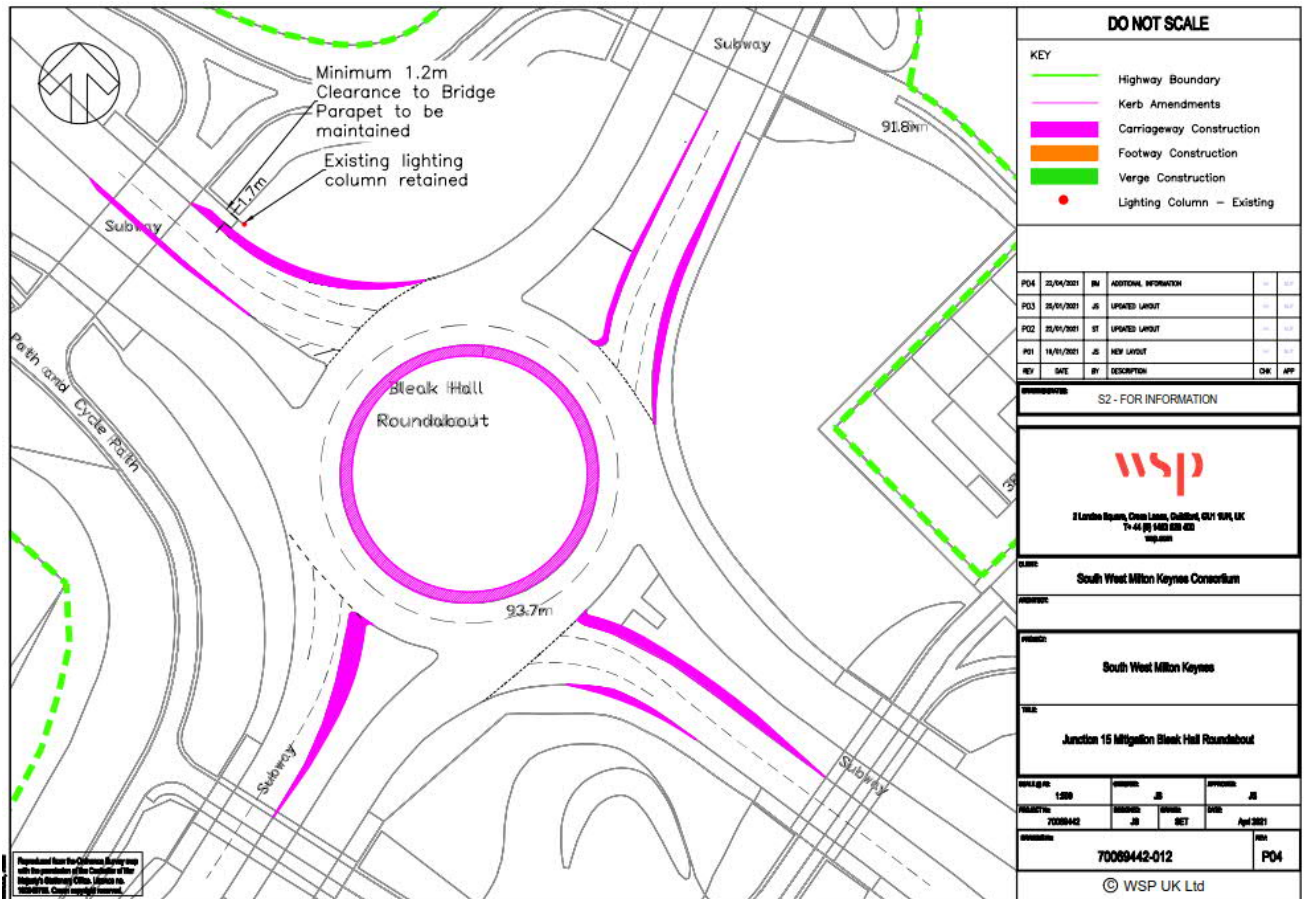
Junction 15: Bleak Hall Roundabout Mitigation Layout
